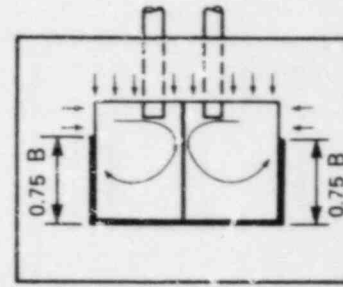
A TYPICAL HORIZONTAL OUTLET SUMP WITH A SOLID PARTITION WALL
